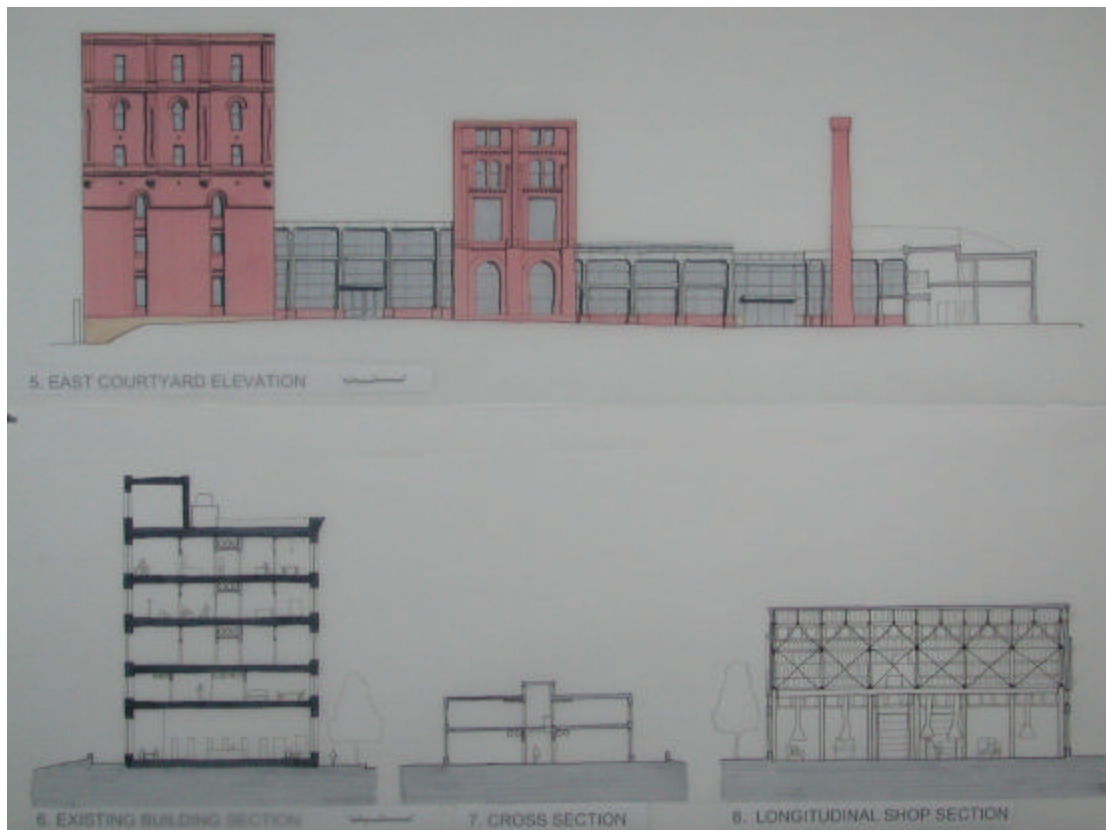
East Courtyard Elevation and sections through Existing Building, Classrooms, and Workshops.
